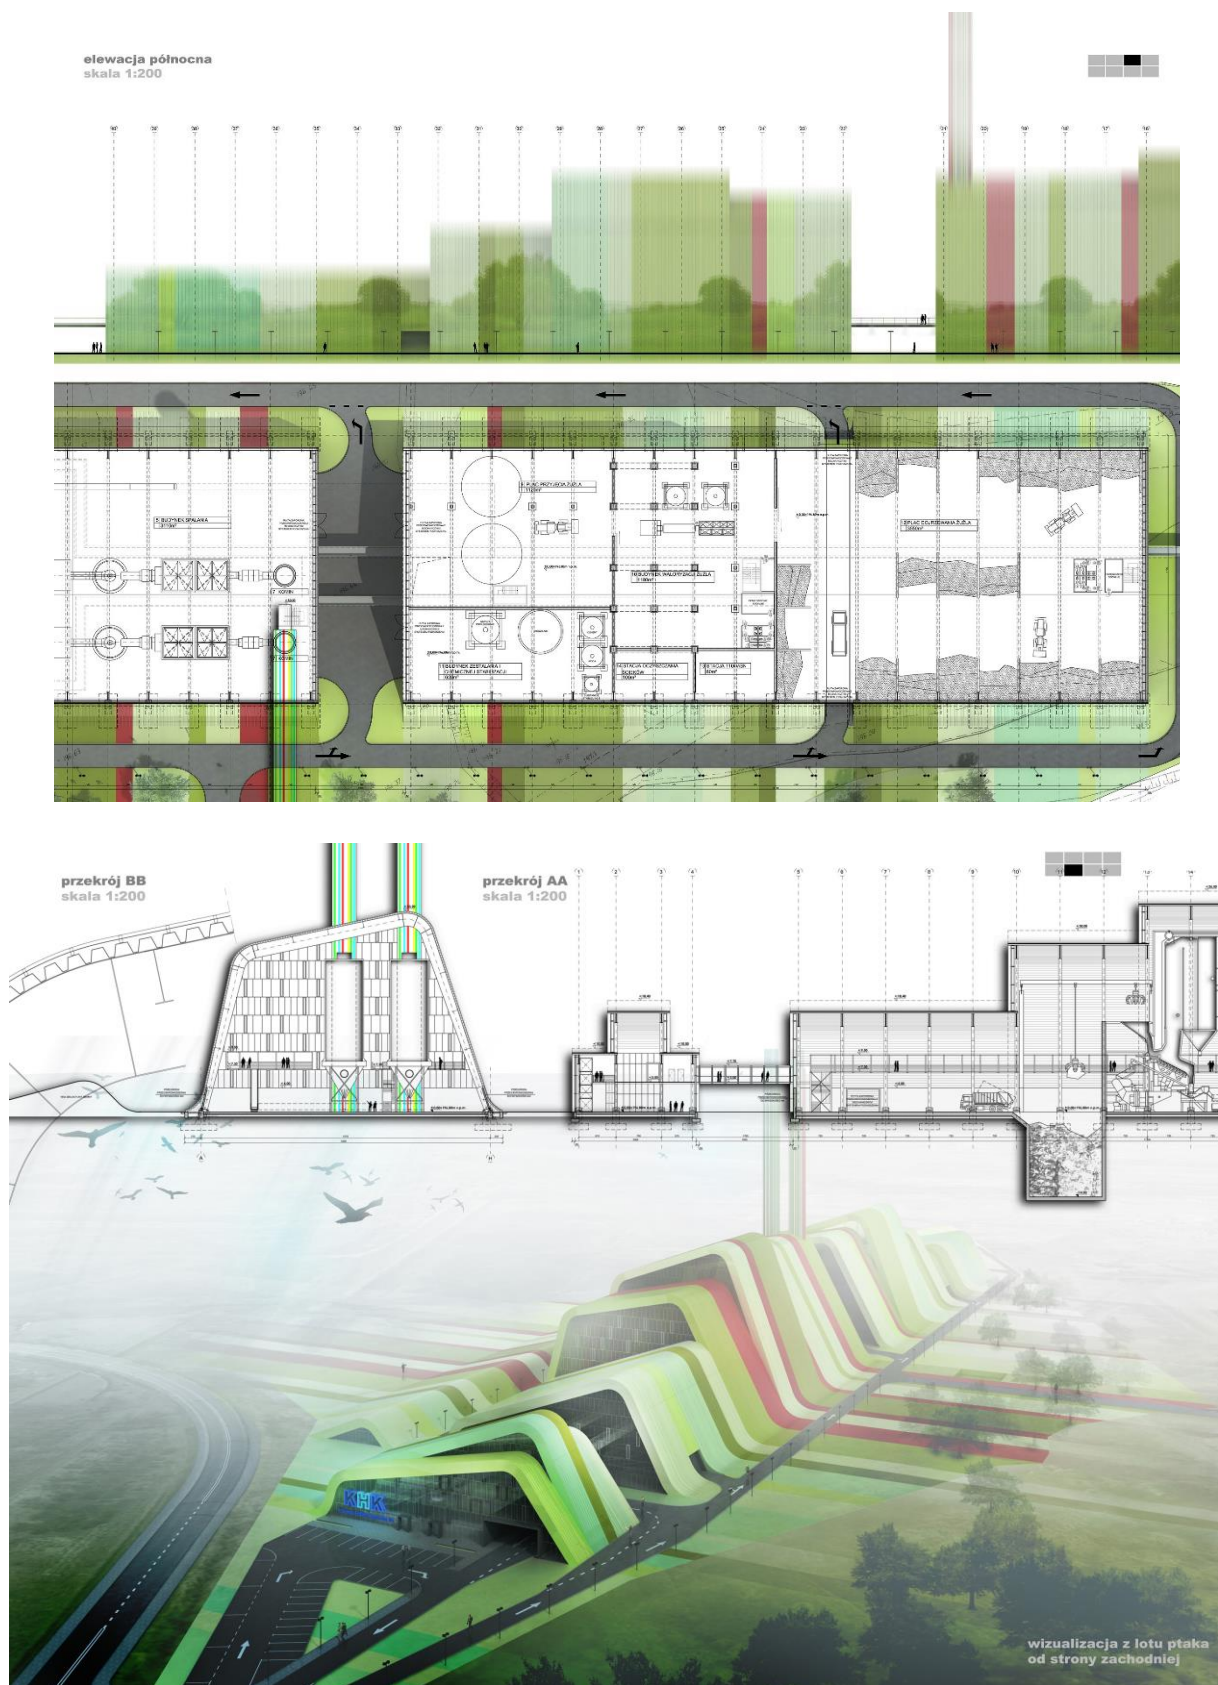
Waste incineration plant in Krakow – plan and elevation.
